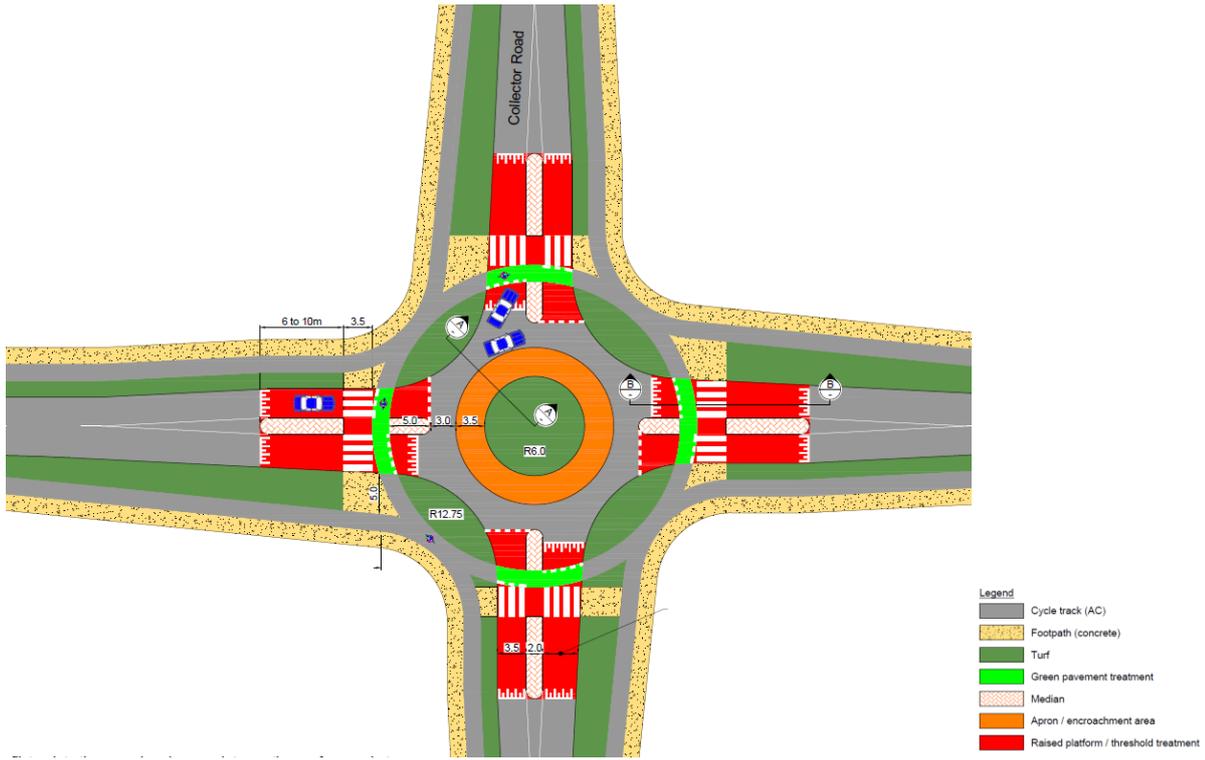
One-Way Cycle Track and Footpath at a Single Lane Roundabout
